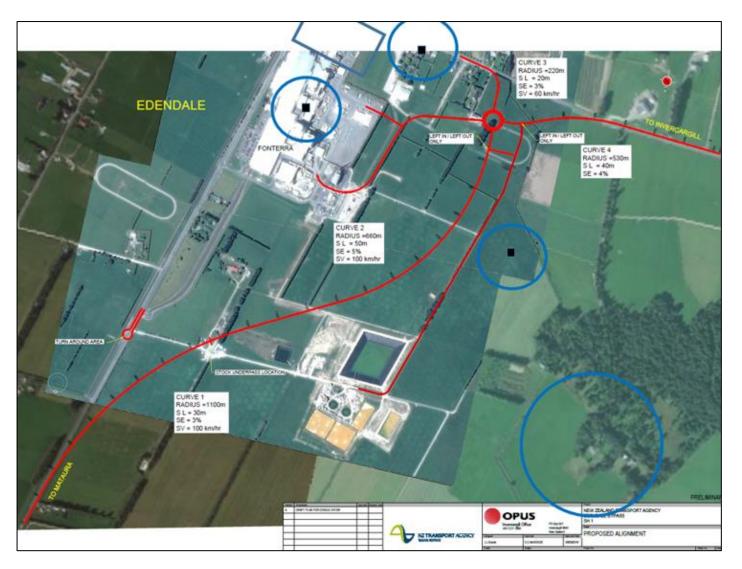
Plan showing the location of the proposed new road alignment/work footprint with layover of locations of 19th century buildings depicted in the 1882 survey plan (DP 128).
